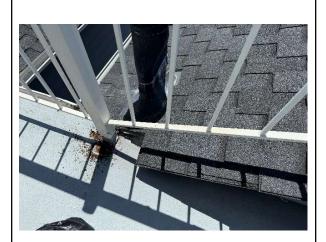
Baseplate exposed to show severe rust damage and damage to structure below.
